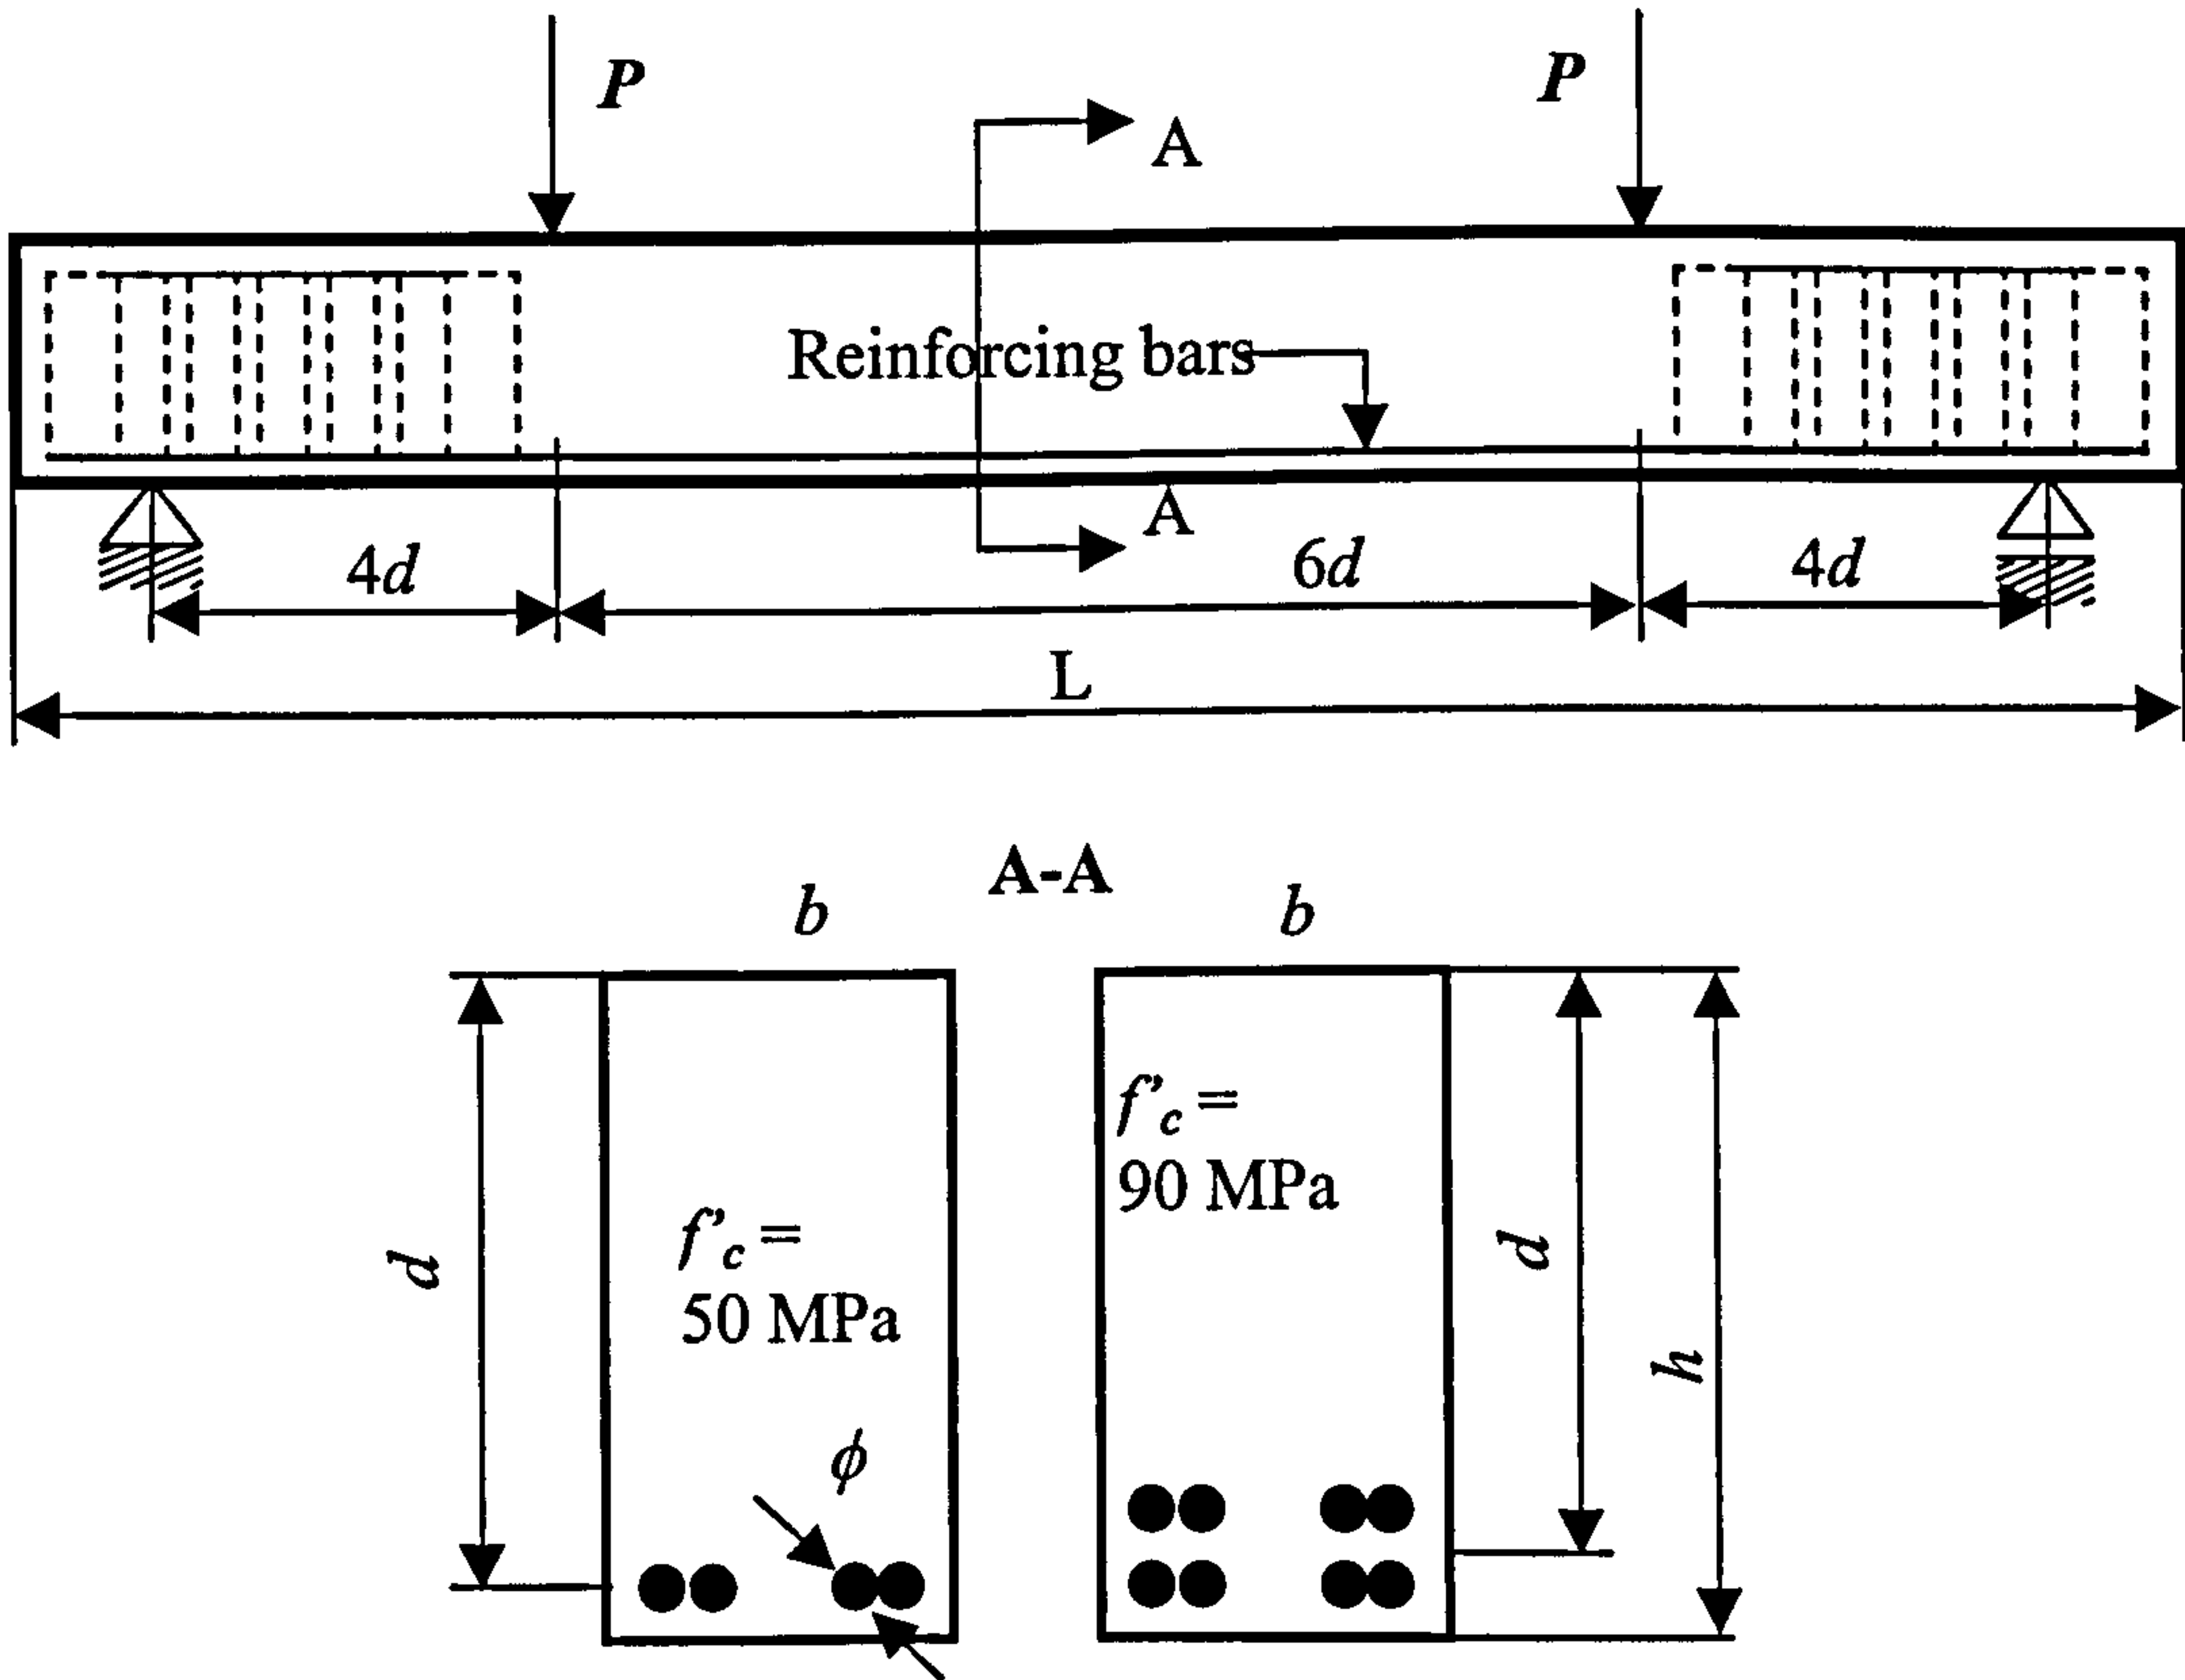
Loading arrangements, cross section and reinforcing bars for experimental beams
